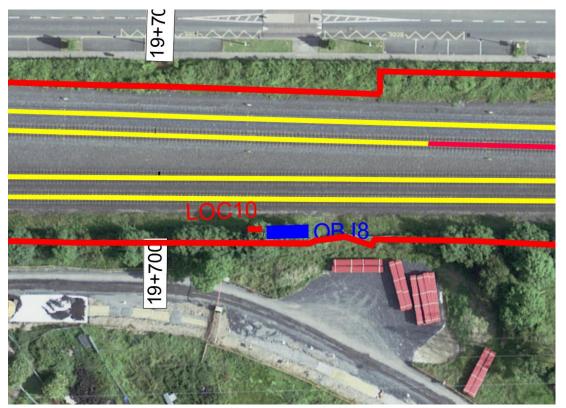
New Signalling / LV Infrastructure location (Approx 700m east of Adamstown Station)
